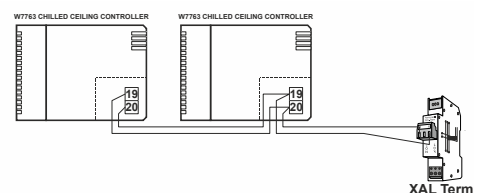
LonWorks wiring layout for one daisy-chain network segment.
